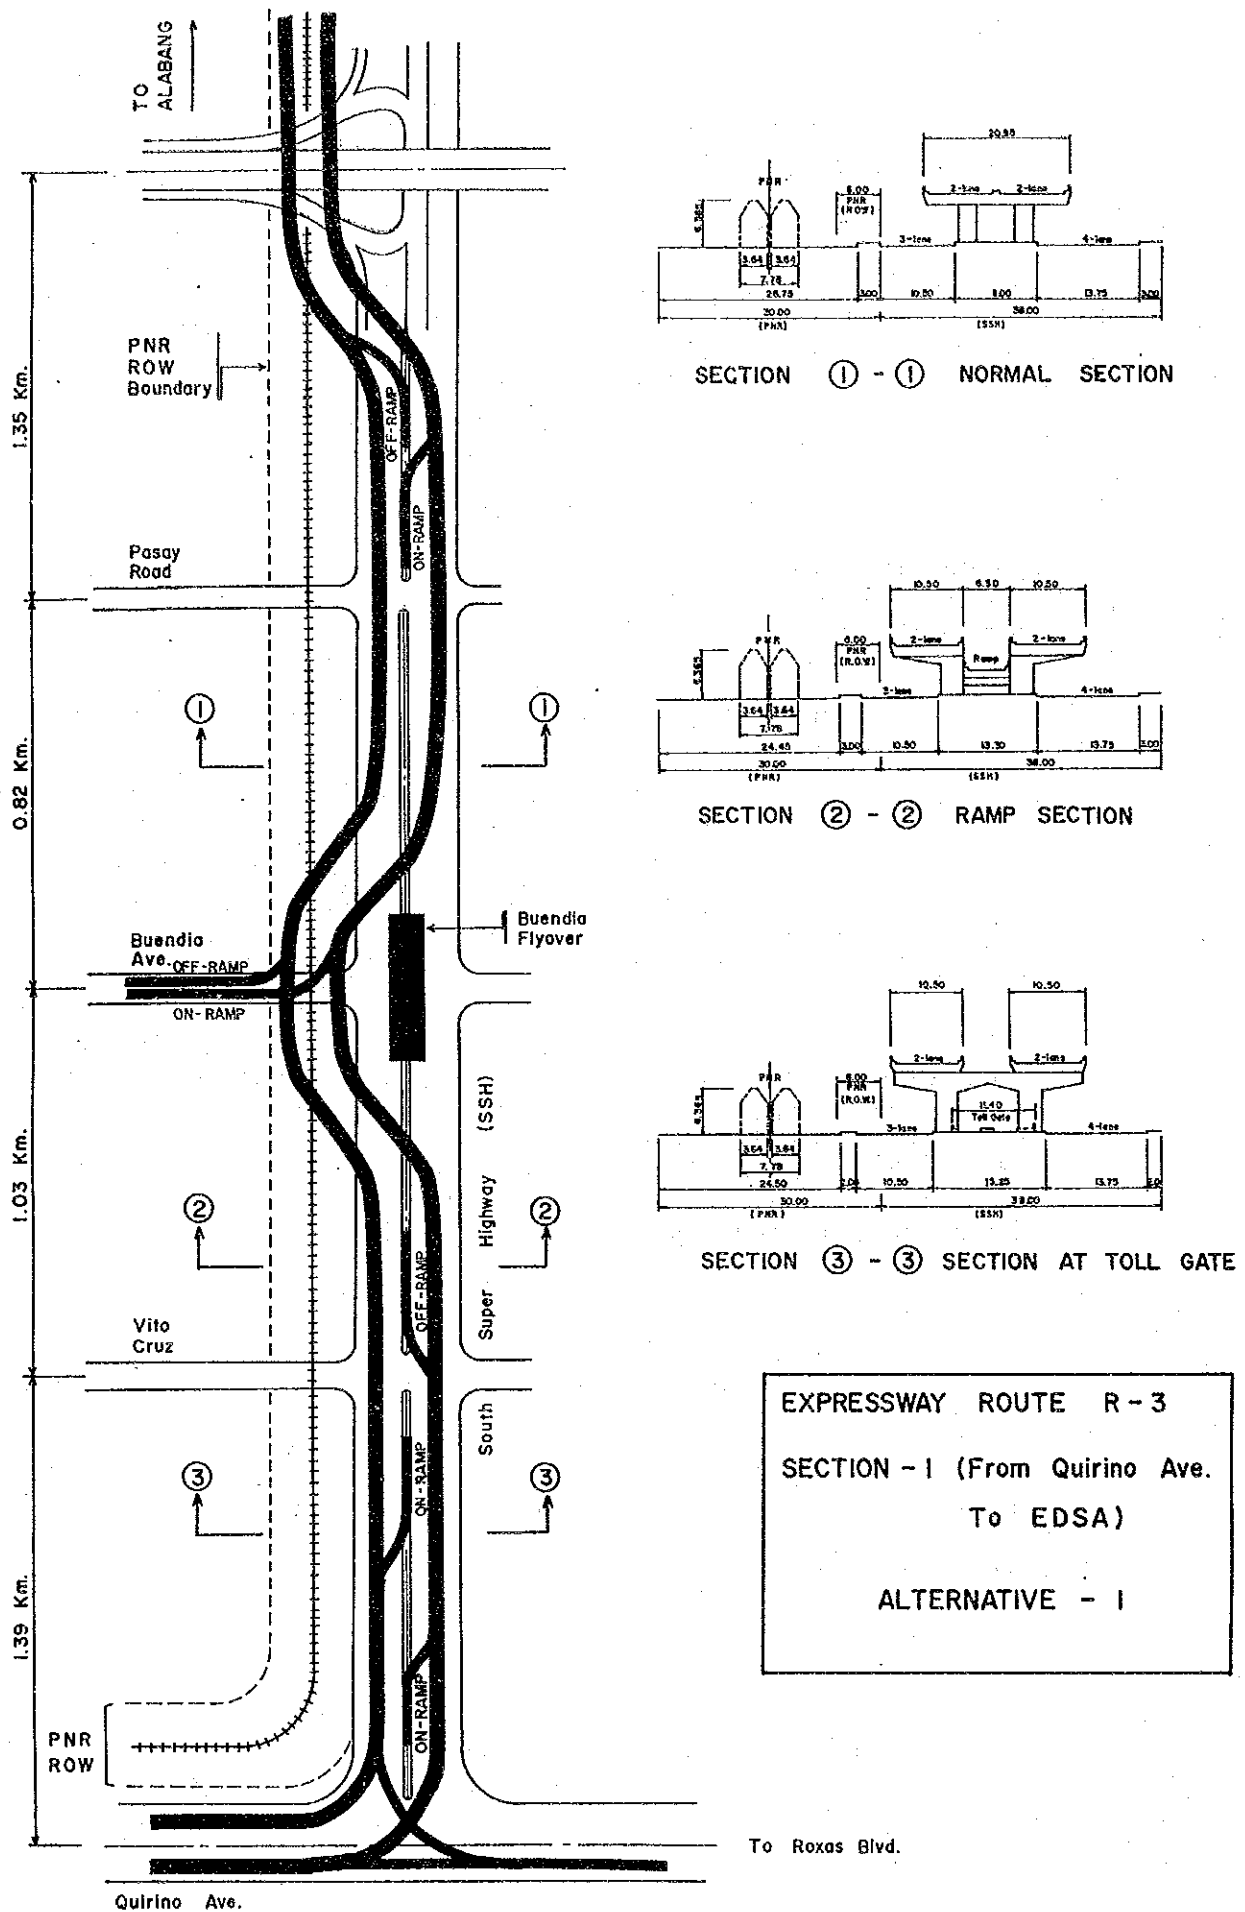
ALTERNATIVE -1 FOR SECTION -1
